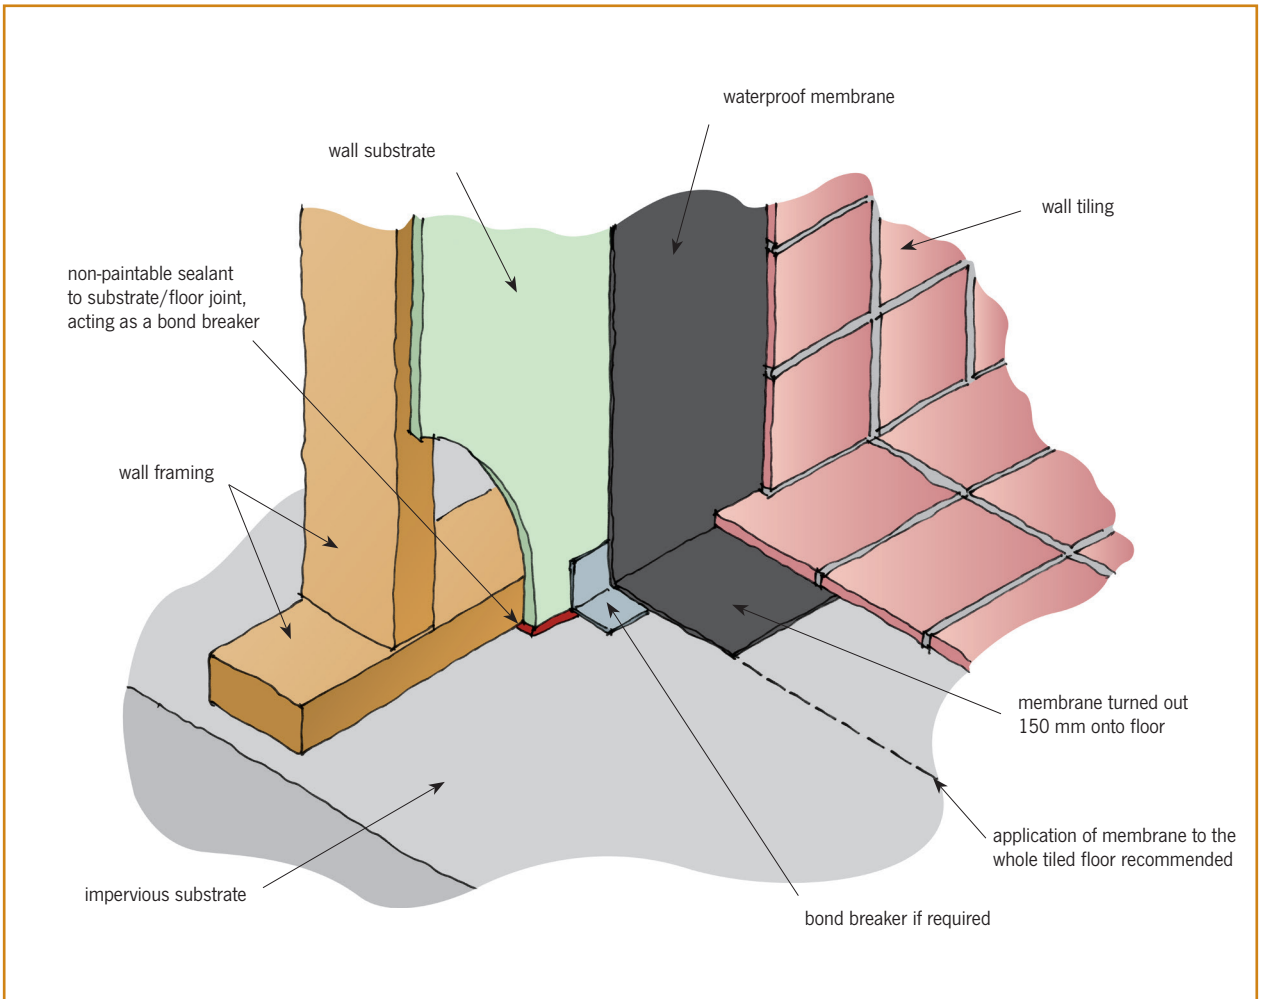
Wall-to-floor junction detail for an impervious floor such as steel-trowelled concrete.
